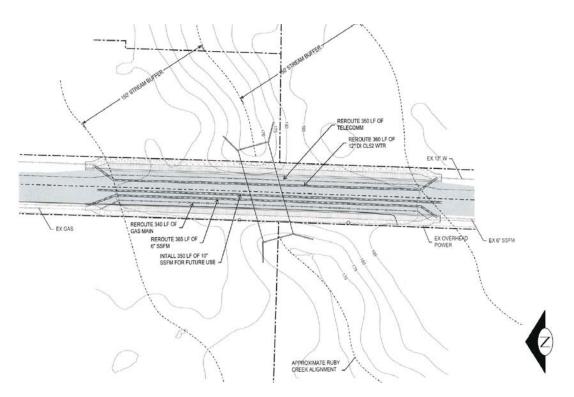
The City has developed preliminary culvert replacement plans for the Ruby Creek culvert under Sidney Road SW and is seeking grant funding for this project.
